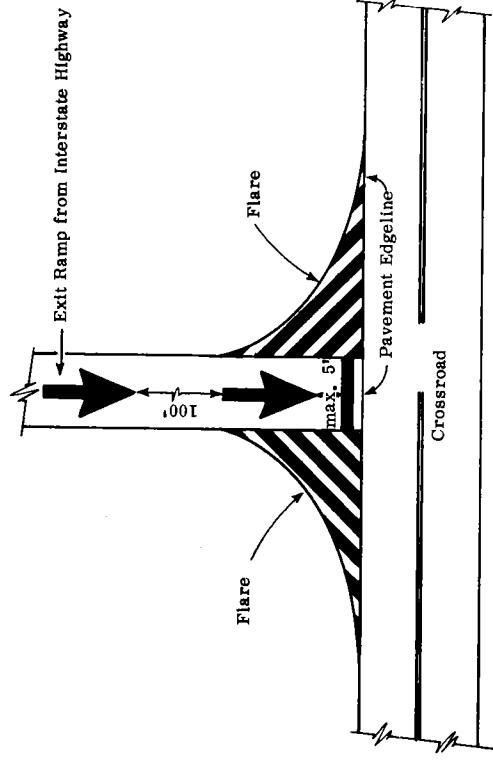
Suggested pavement stripe or removal of flares on exit ramps.
